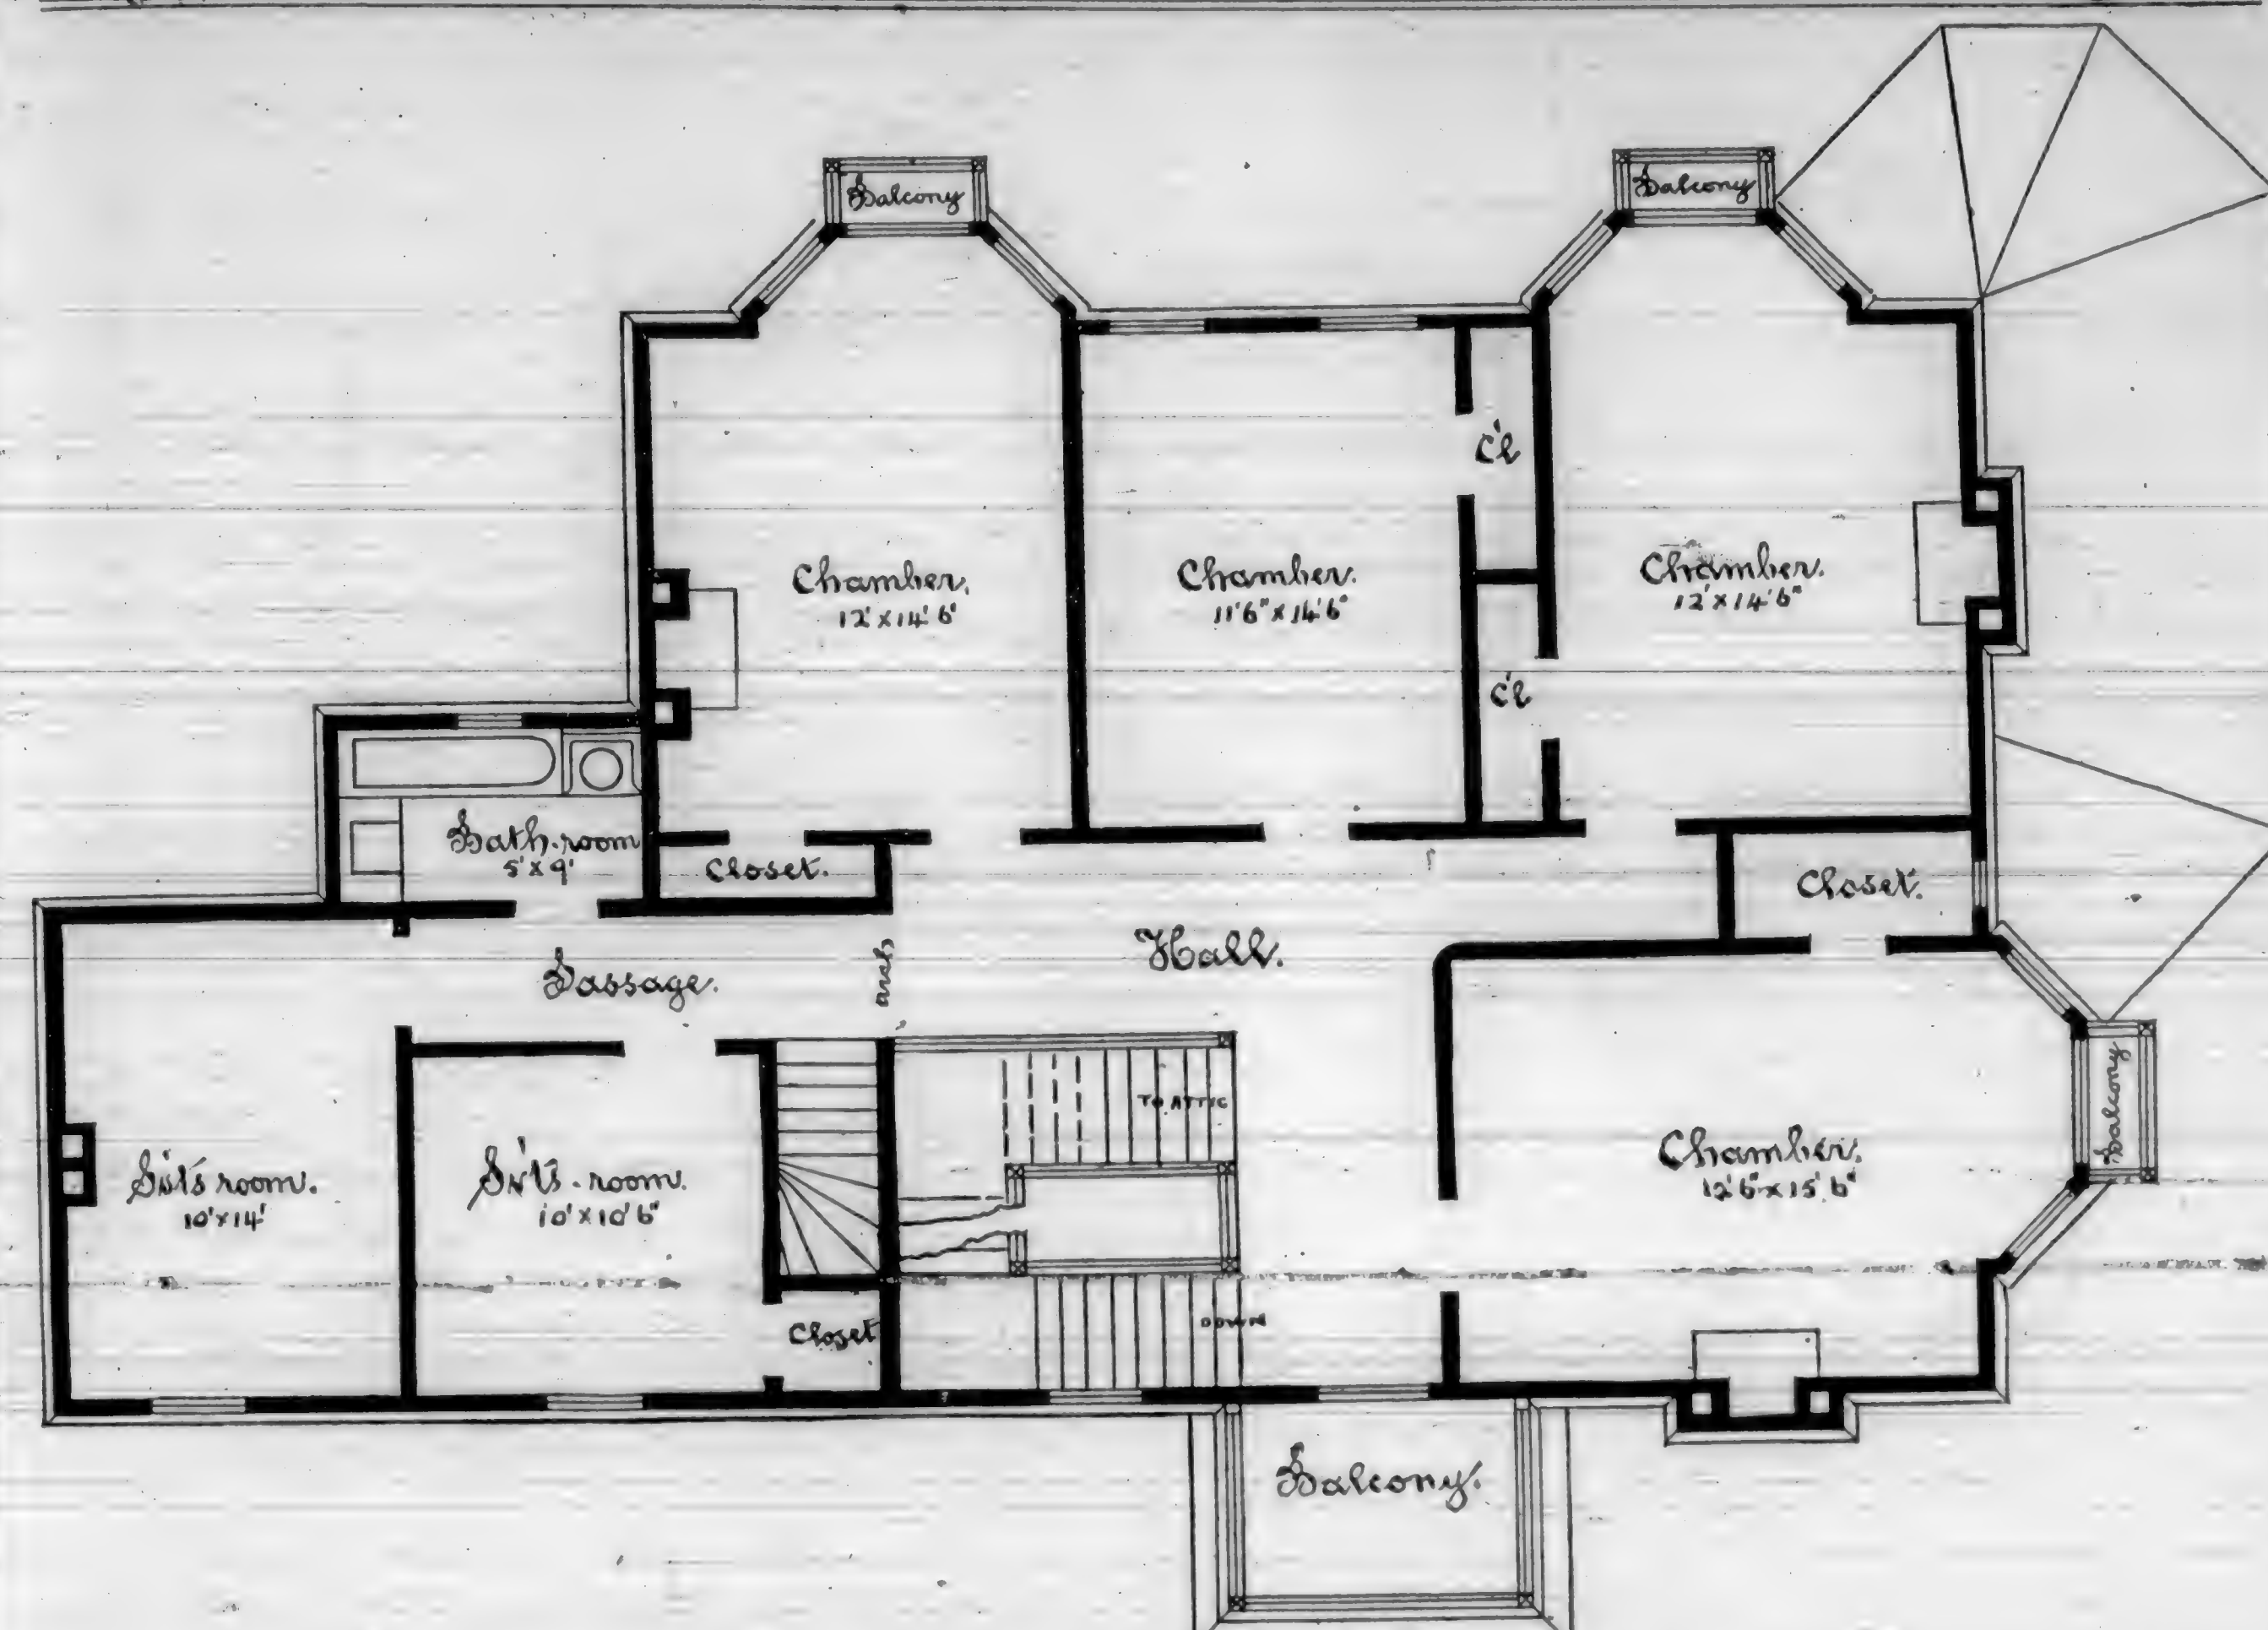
SECOND STORY PLAN OF \$10,000 DWELLING.
